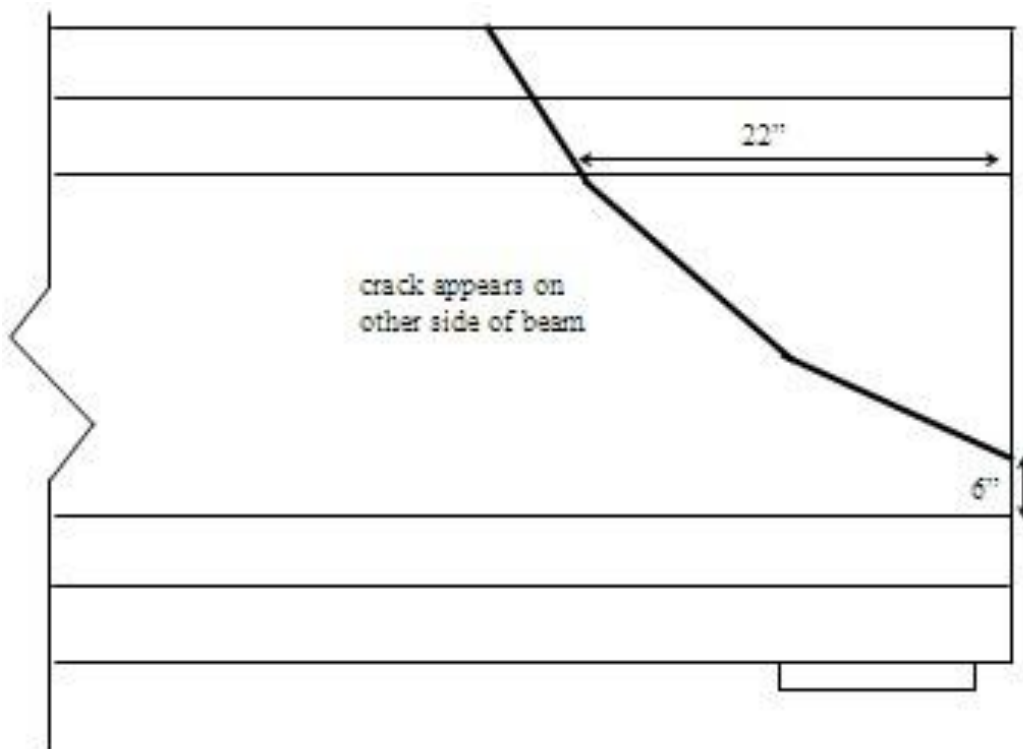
Crack diagram for north span girder, exterior beam, east face, north abutment (#7933).
